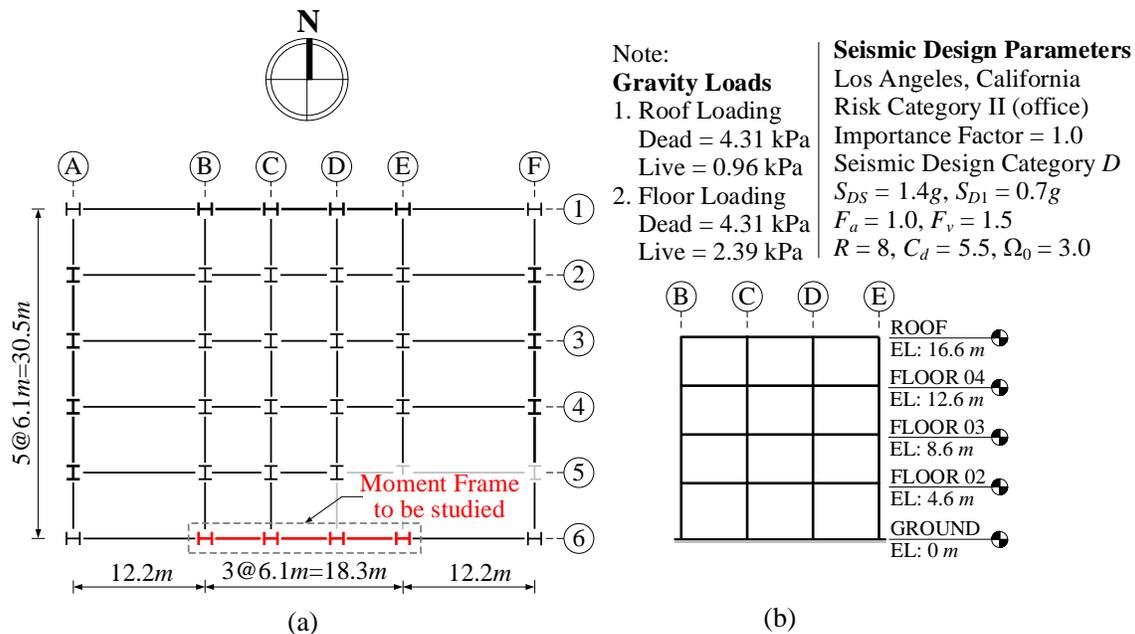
Typical archetype steel frame buildings: (a) plan view; and (b) elevation of the four-story steel MRF
